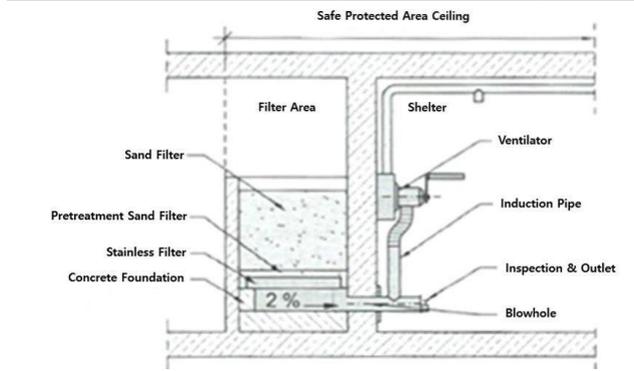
Plan Design of Ventilation system and emergency exit[6]
